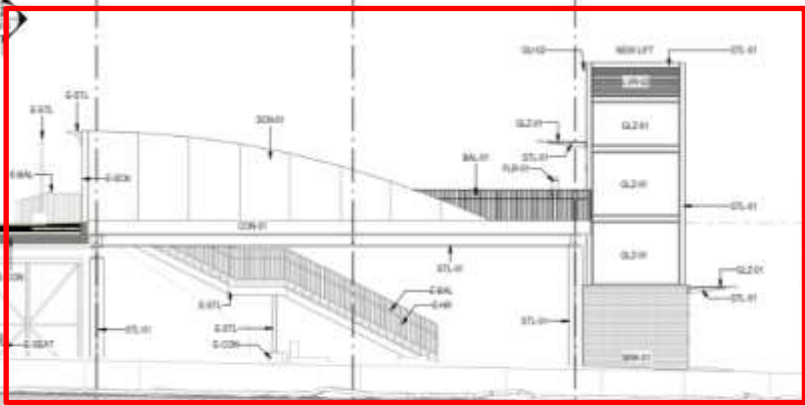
Hazelbrook Railway Station – Proposed lift with new screens and balustrades outlined in red. (Source: DesignInc)
